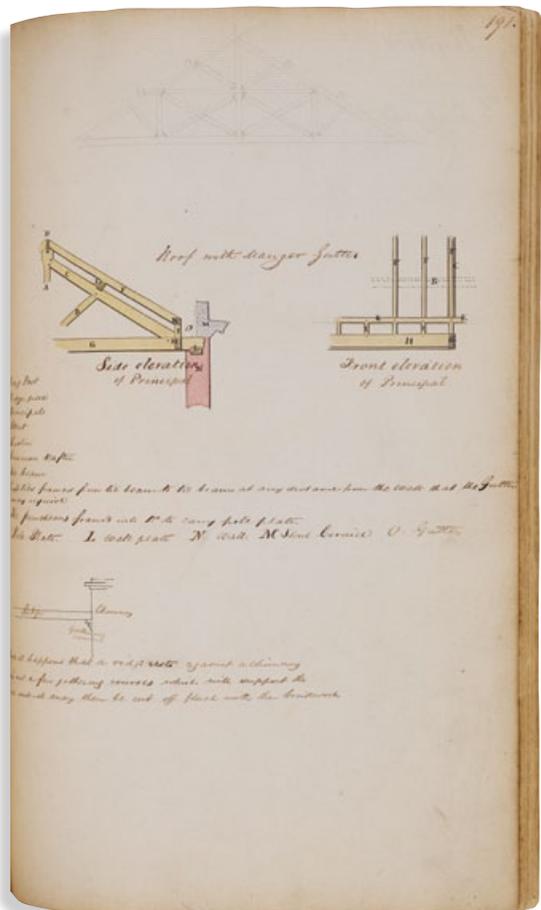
Parapet Gutter Construction Detail, sheet 191.
